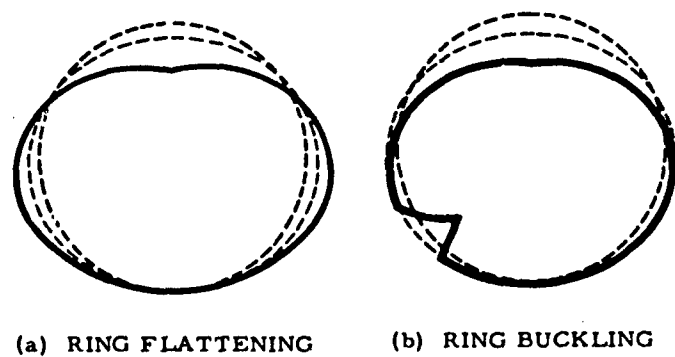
Two Types of Structural Ring Failure of Buried Flexible Pipes
